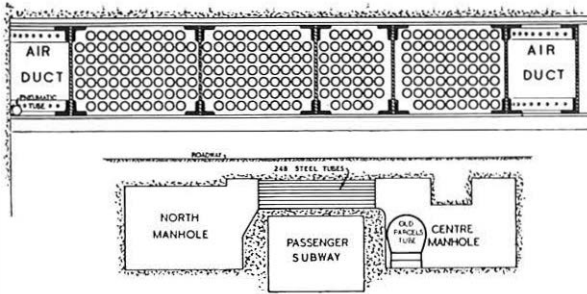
ACCOMMODATION OF STEEL PIPES OVER PASSENGER SUBWAY.
